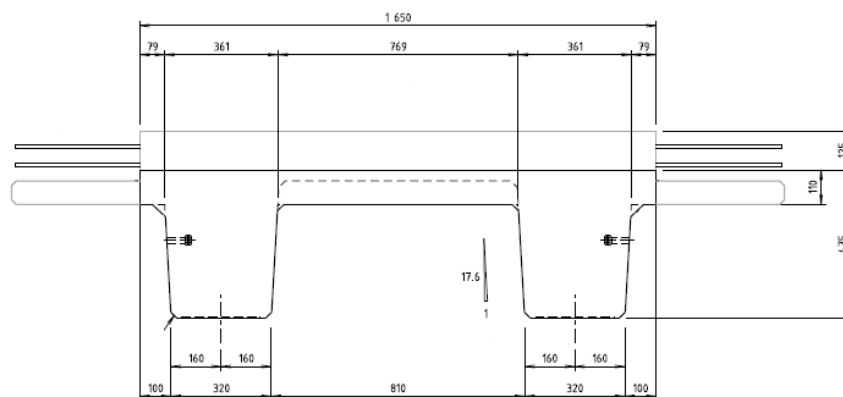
Standard plank cross sections (Structural Concrete Industries, n.d.)
